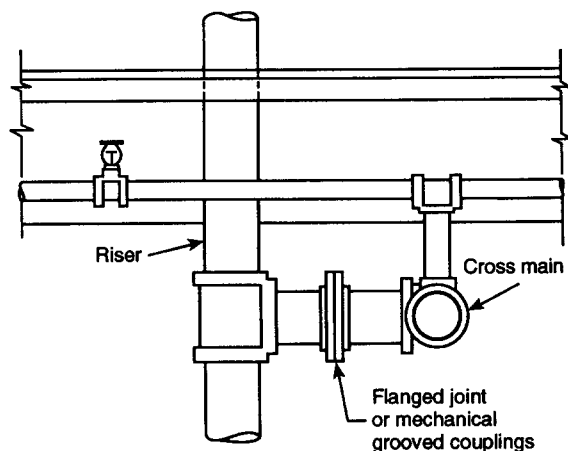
One arrangement of flanged joint at sprinkler riser.
